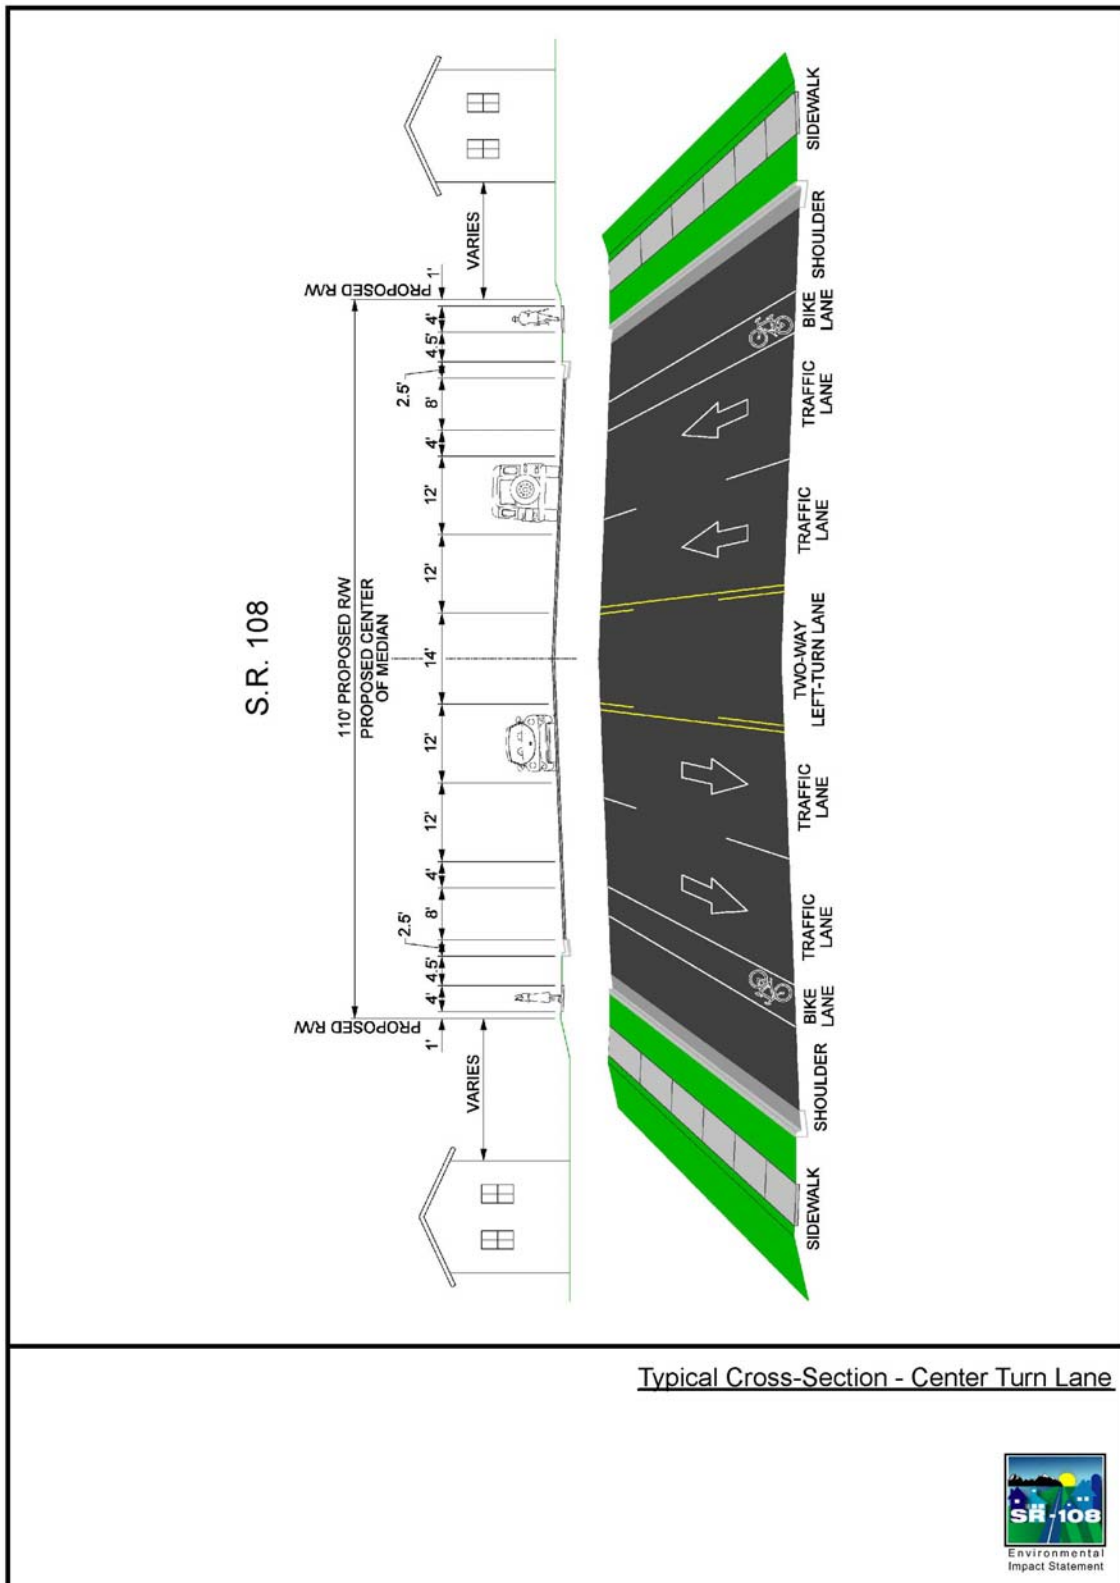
Typical Cross-Section – Center Turn Lane
